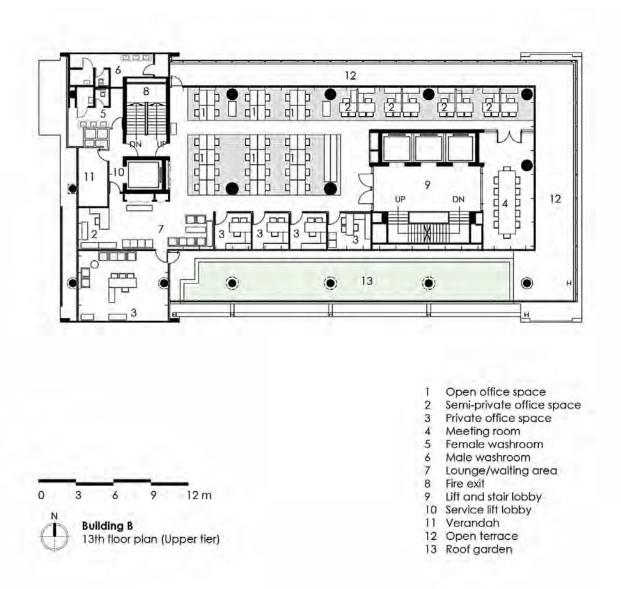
Floor plan of Building B: Upper tier (Source: Building B interior designers, edited by author)
